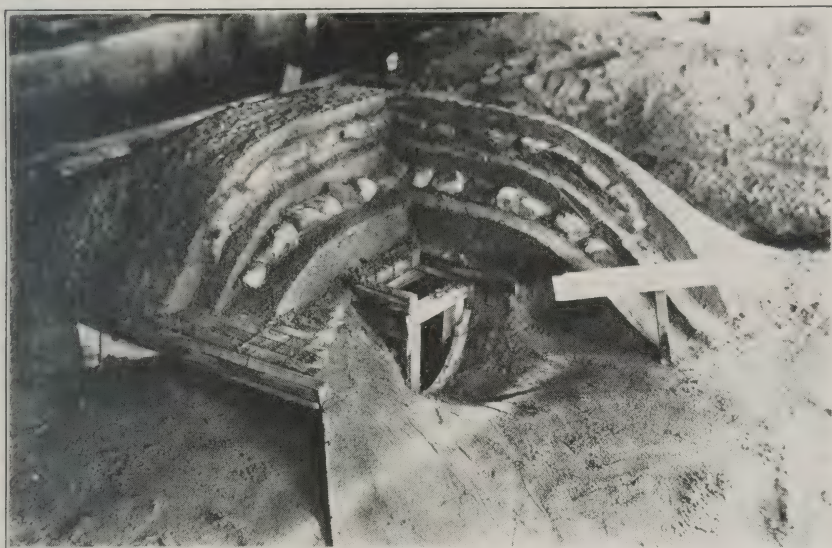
Machine Gun Emplacement. Cut and cover roof. Cover: 6 inches earth, sacks of cement dipped in water and hardened, double layer, 12 inches earth, 18 inches rock, 2 feet earth, heavy timber.
